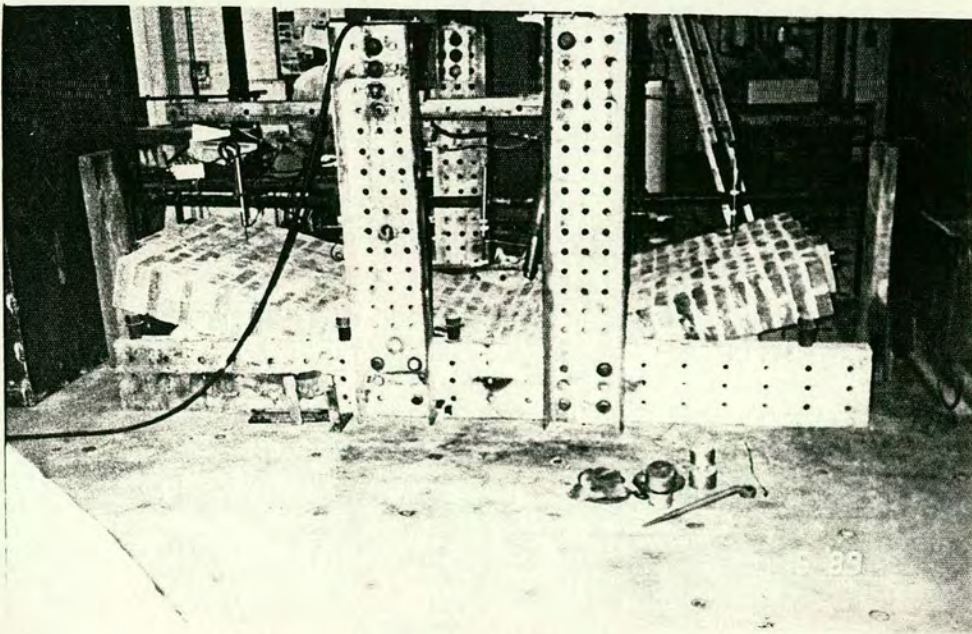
Typical failure mode and longitudinal crack along the pocket boundary for beams/slabs
